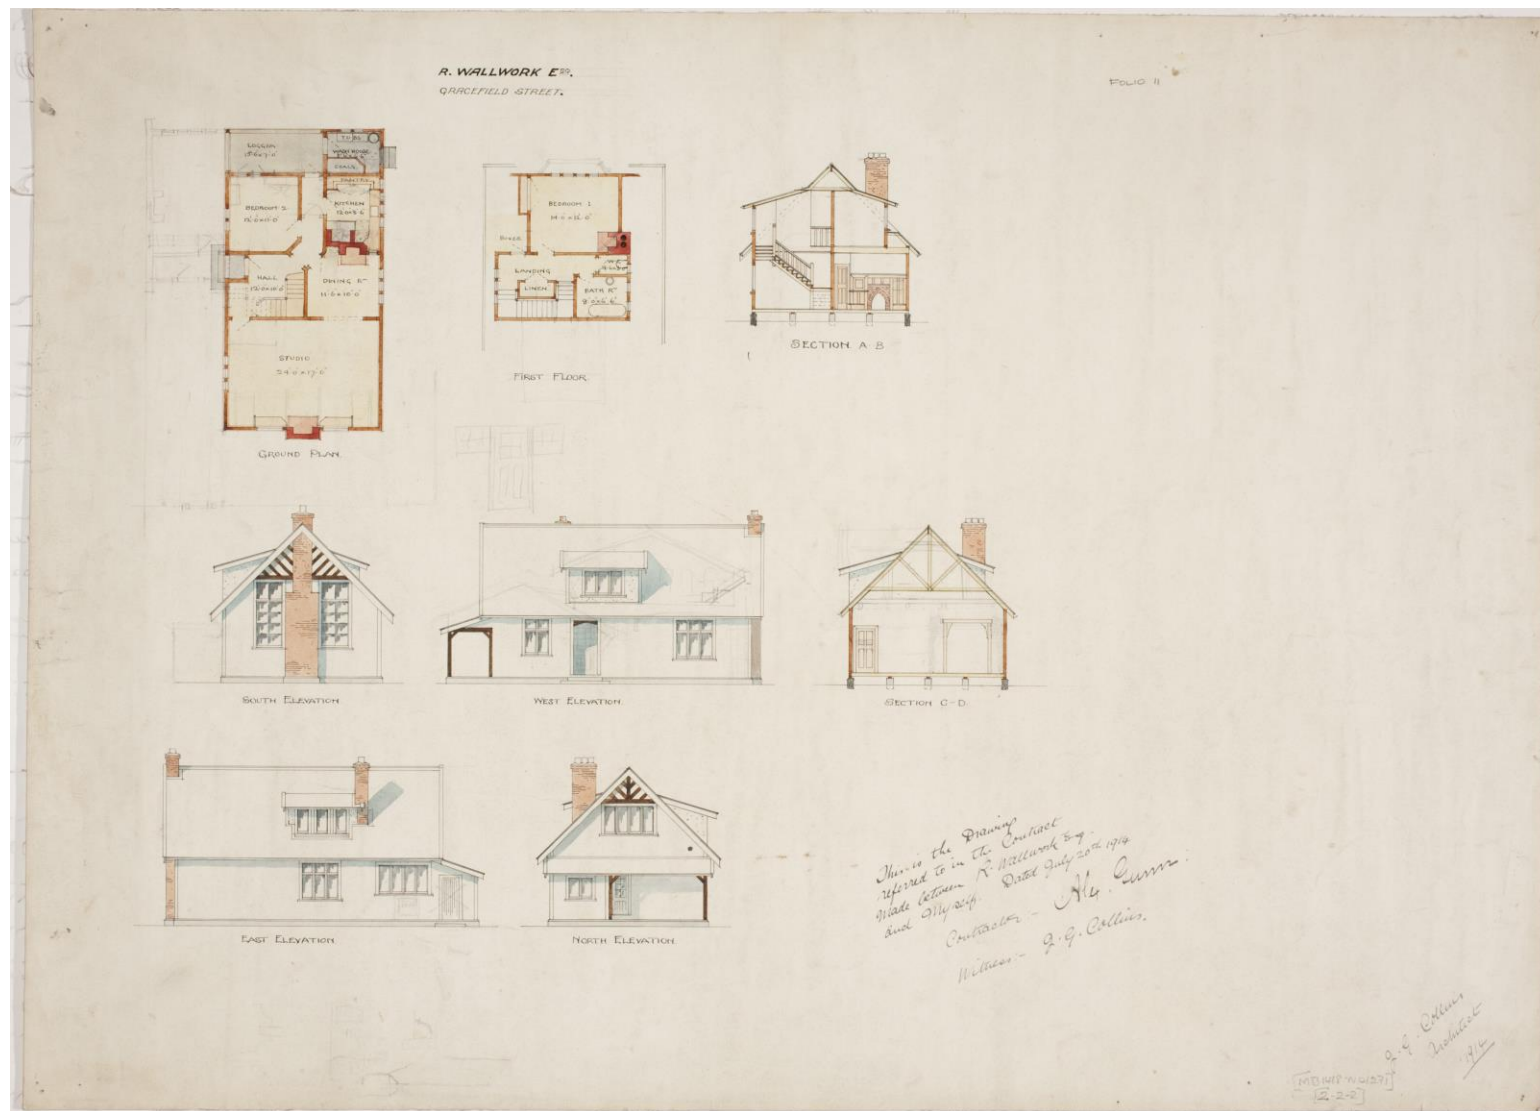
Collins and Harman, R. Wallwork, Esq., Gracefield Street, plans, elevations and sections (1914).
